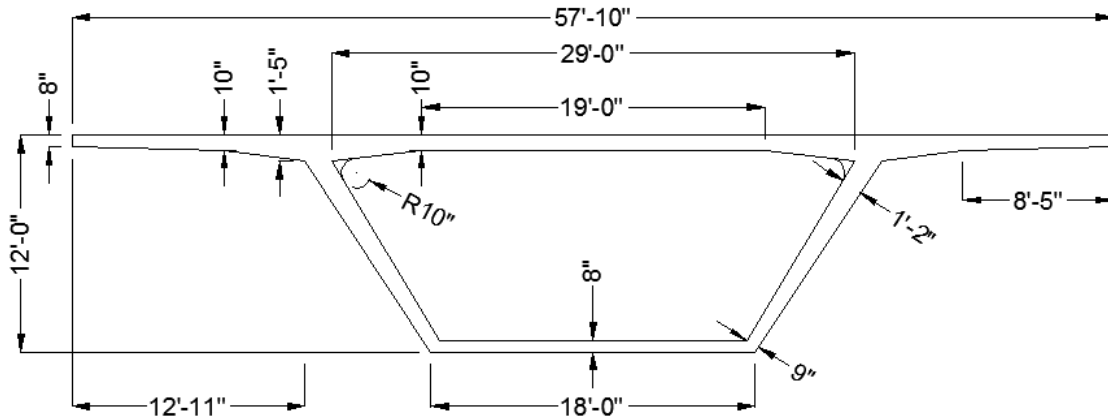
Varina-Enon Bridge Cross Section Dimensions
